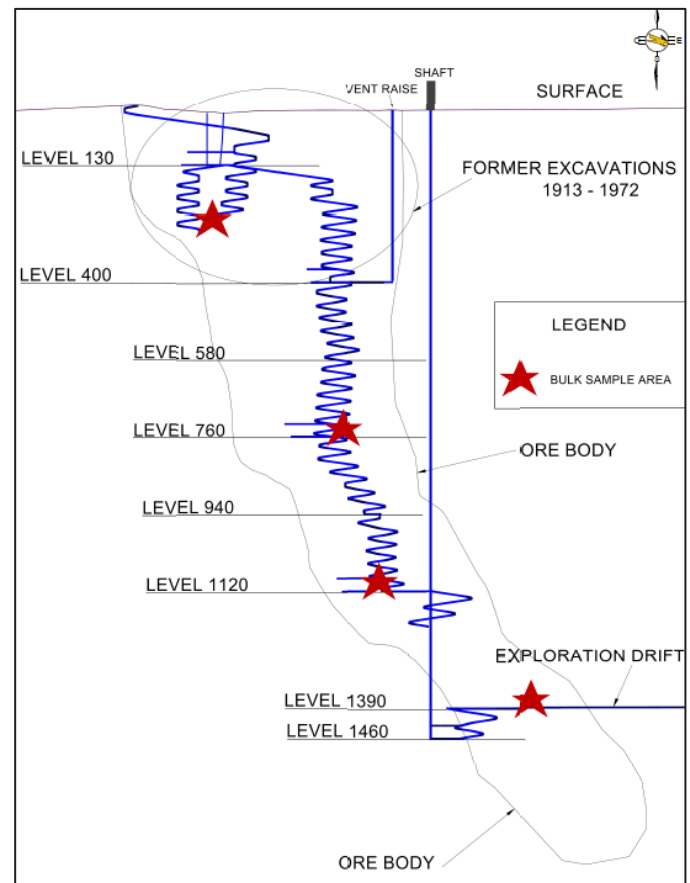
SCHEMATIC PROPOSED WORKING
